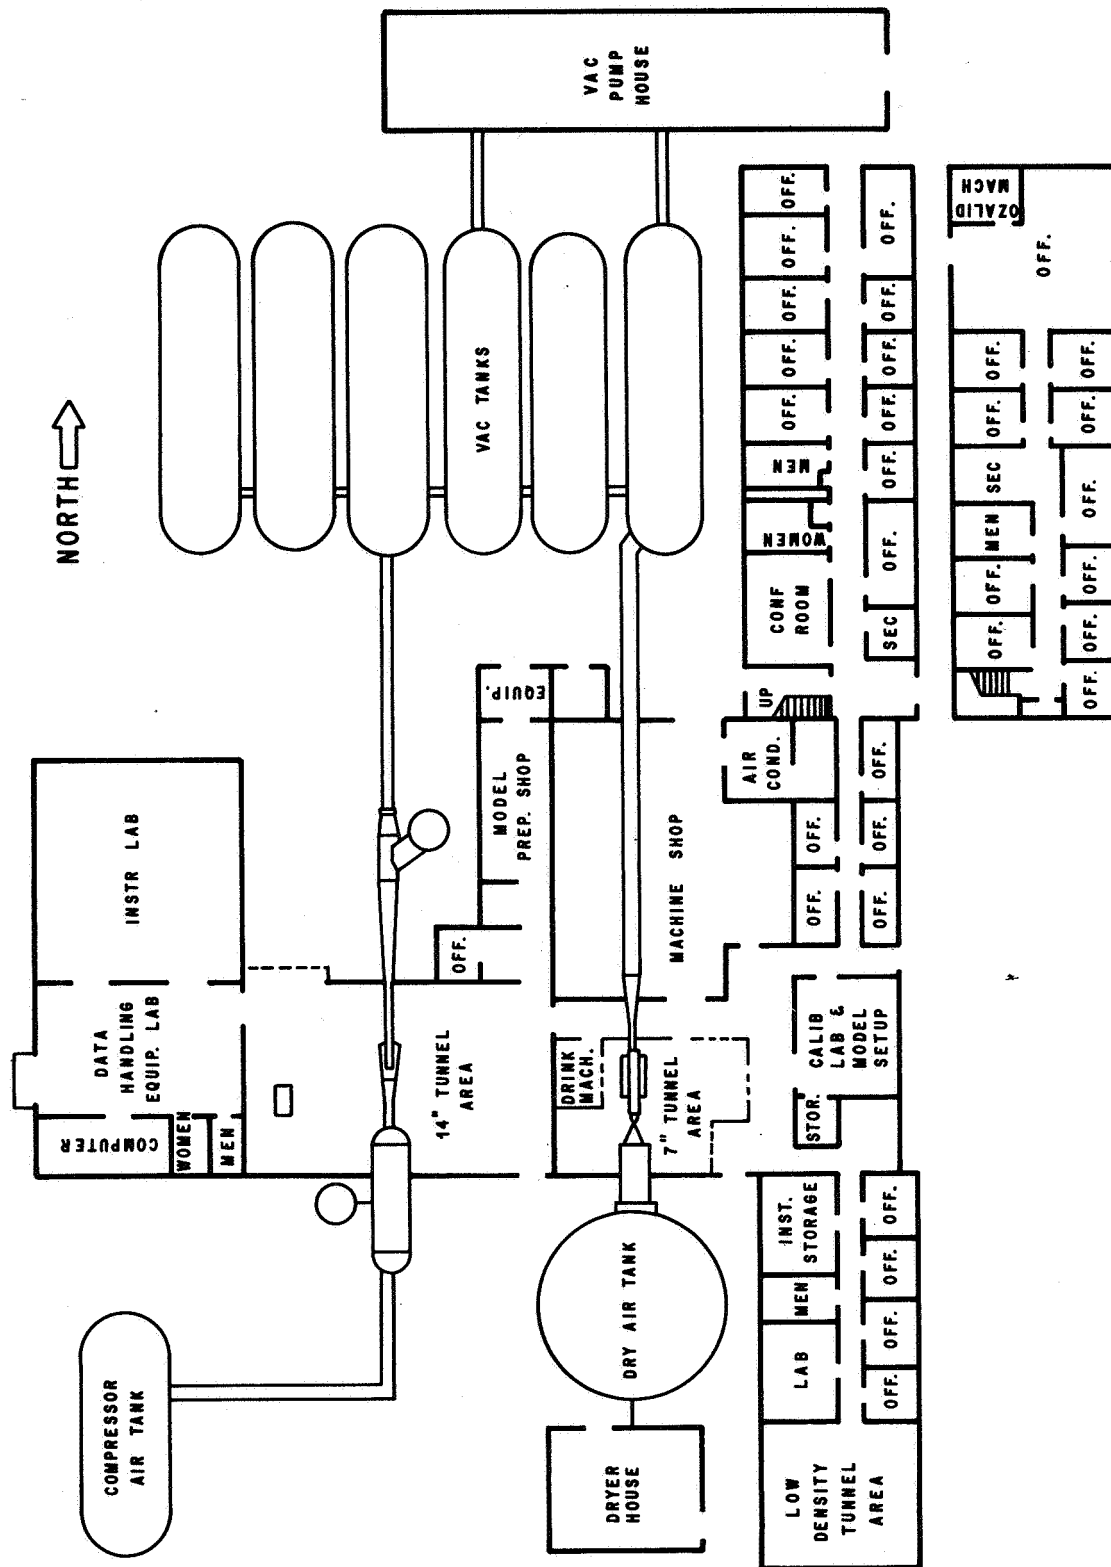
LAYOUT OF WIND TUNNEL BUILDING
